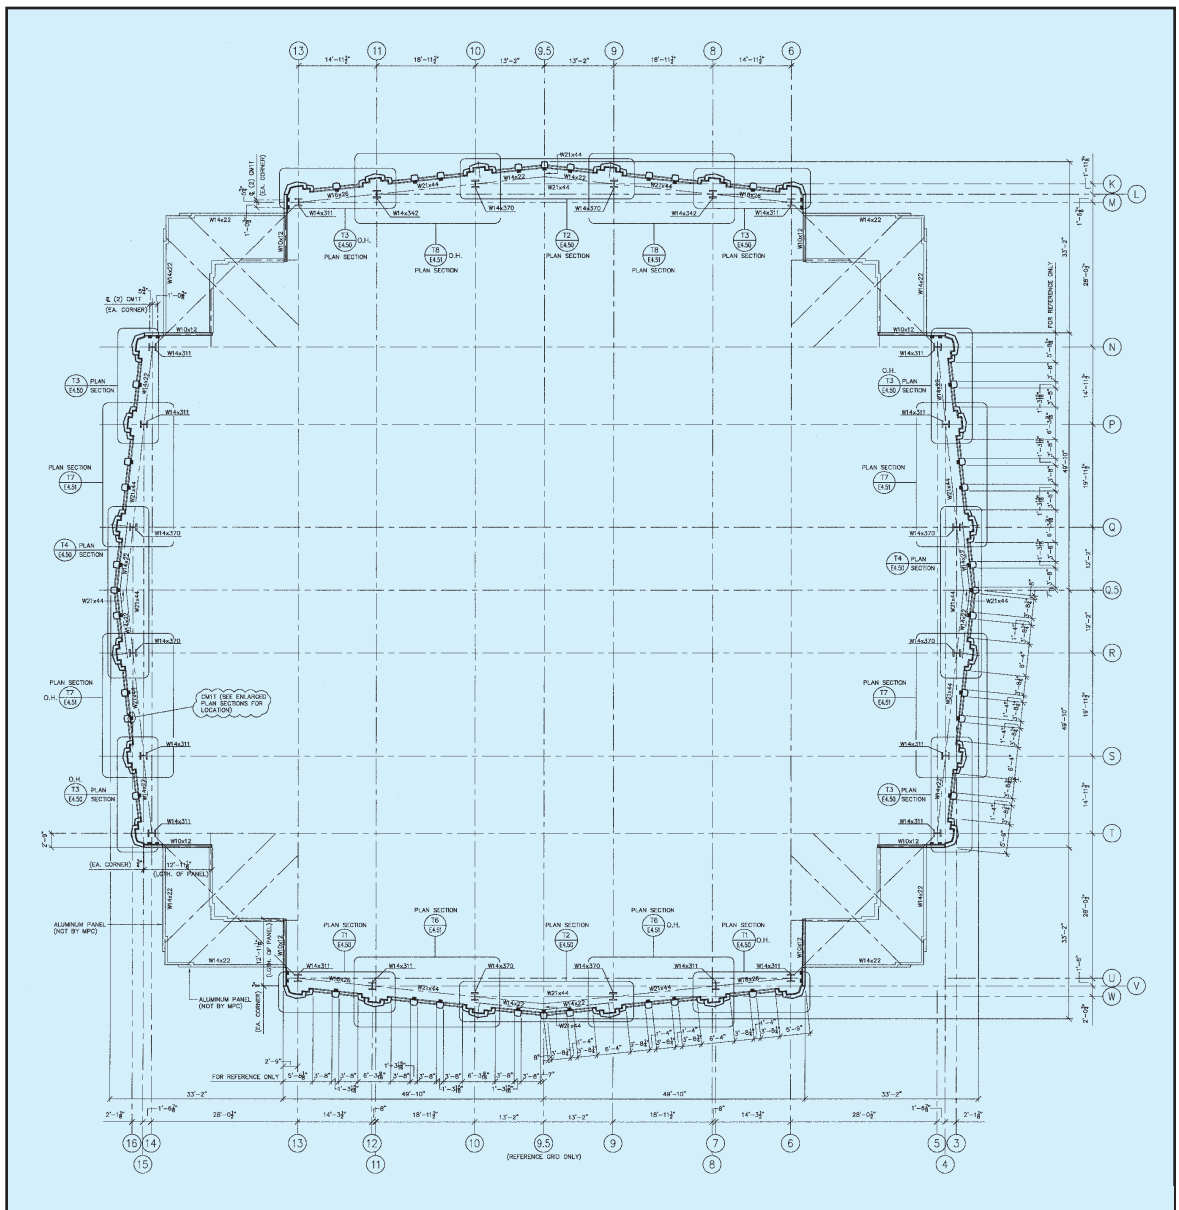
Floor plan of the Hearst Tower at Level 19.
